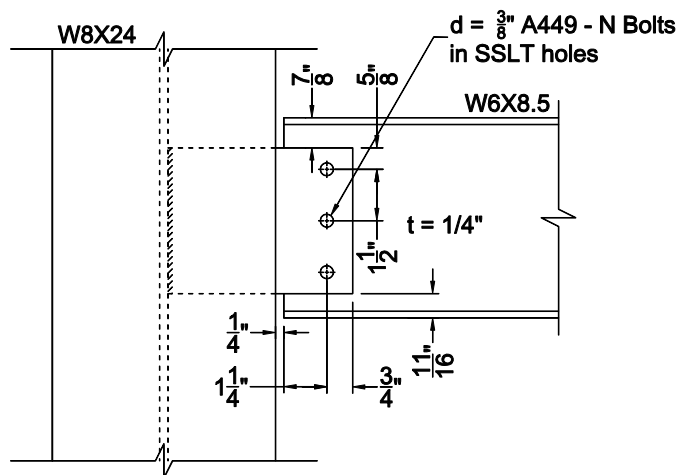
Half-scale Beam-to-Column Shear Tab Connection
